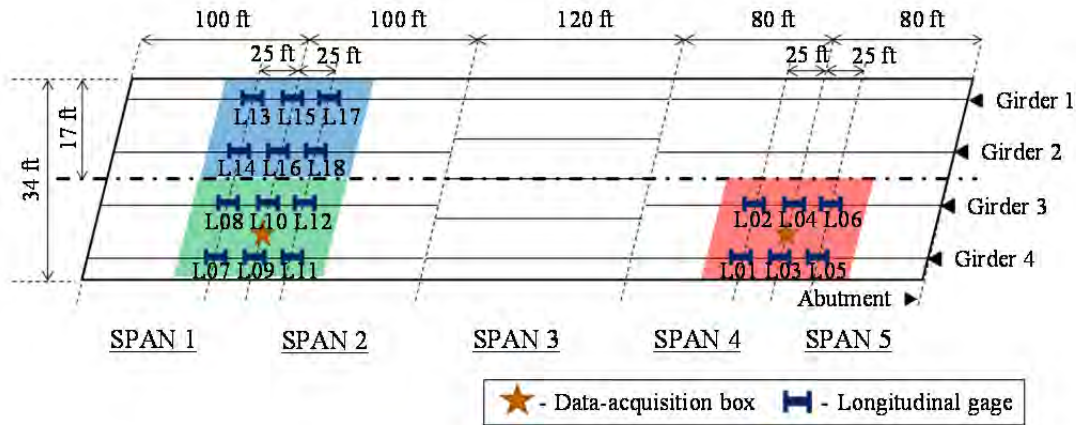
Gage layout for longitudinal bars, Lampasas River Bridge
